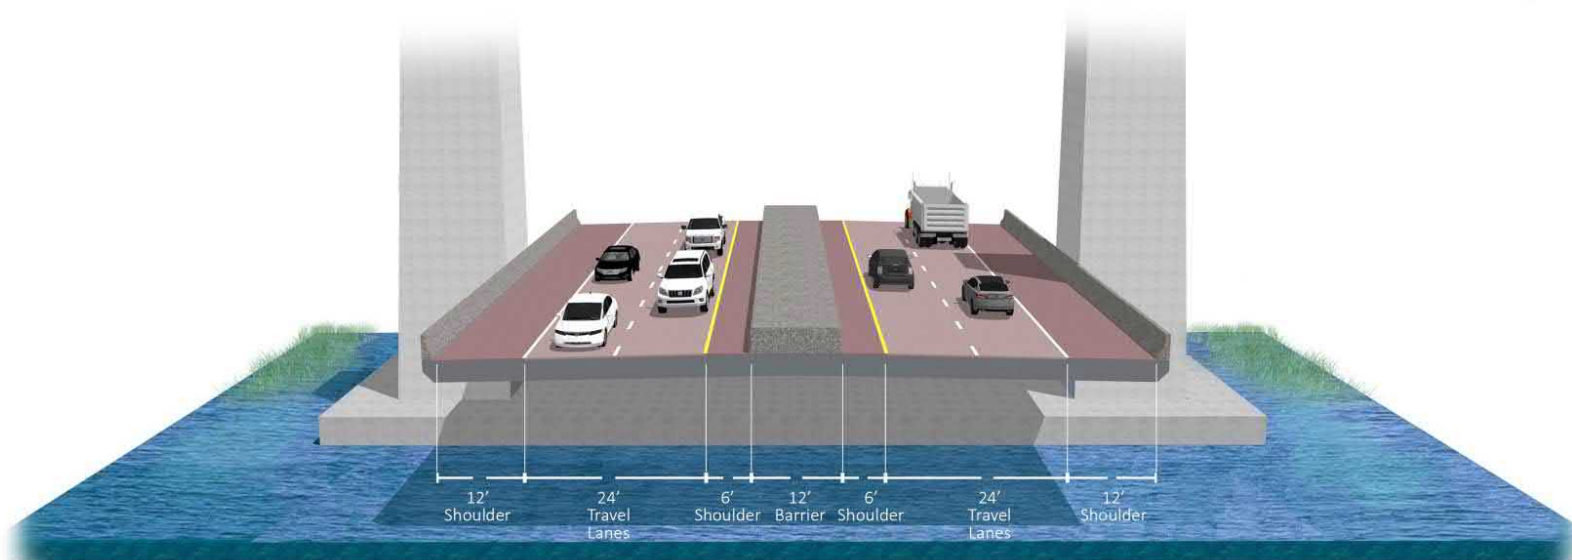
Current Detailed Study Alternatives Typical Section – Cape Fear River Bridge Crossing
